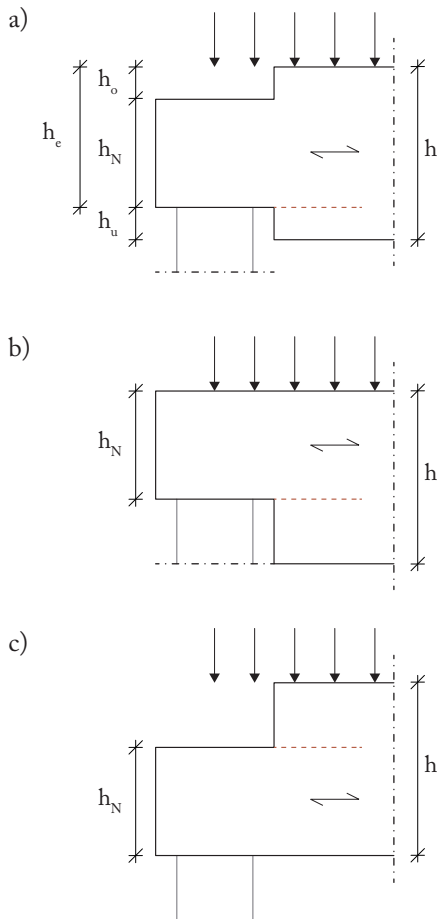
Relevant geometry of Notched joint b. top notch, c. bottom notch and a. Tenon joist.
